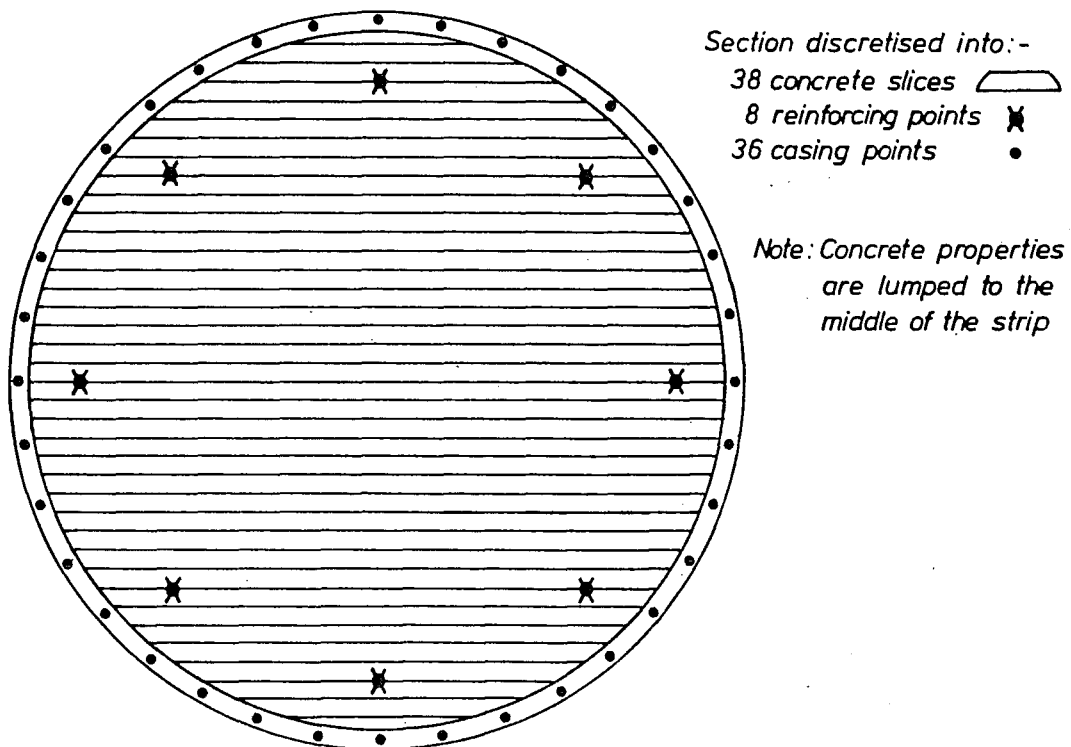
DISCRETISATION OF STEEL-ENCASED REINFORCED CONCRETE SECTION
